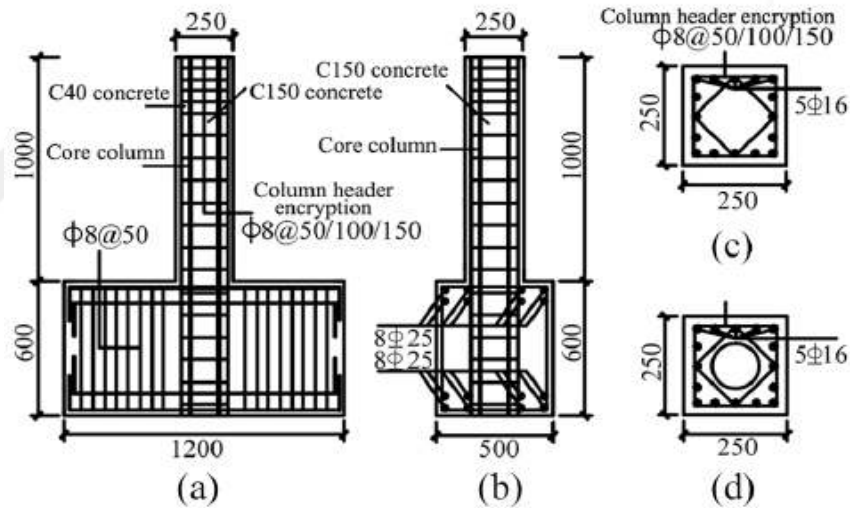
Specimen's details: (a) façade, (b) side view, (c) column head and (d) composite column section (Yang et al., 2016)
